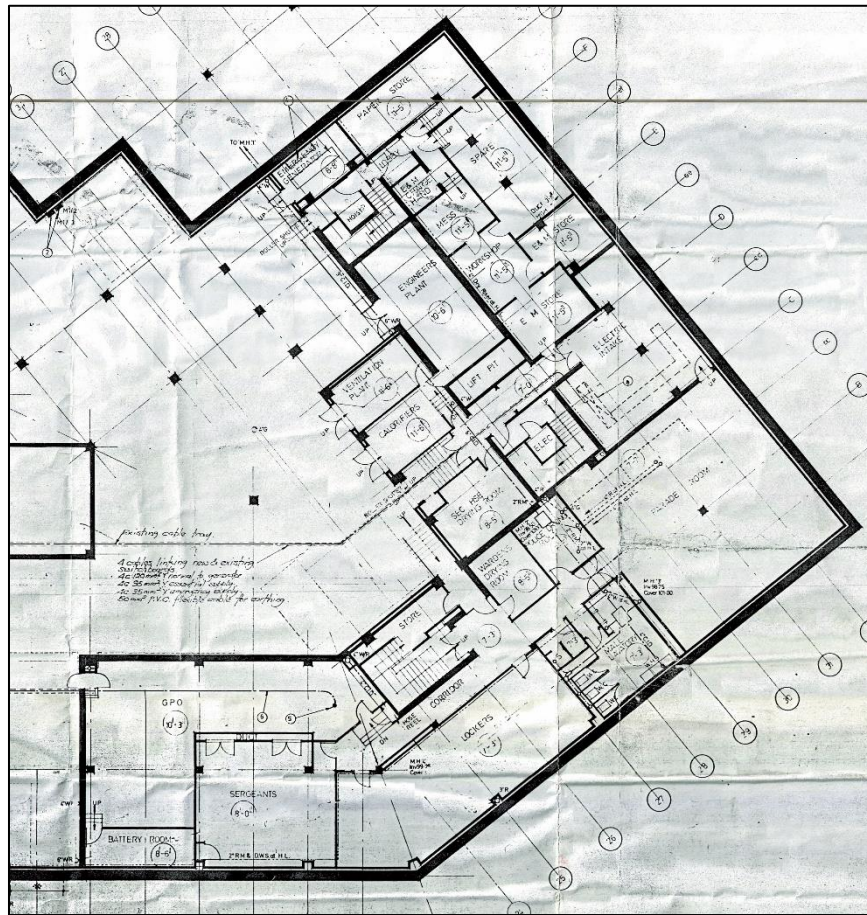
A labelled 1979 plan of the pentagonal building basement, not to scale (Chief Engineers Office, Metropolitan Police, 1979)
